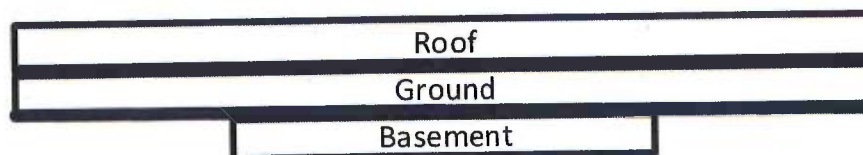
Multi Storey GIS Building Arrangement – Layout
